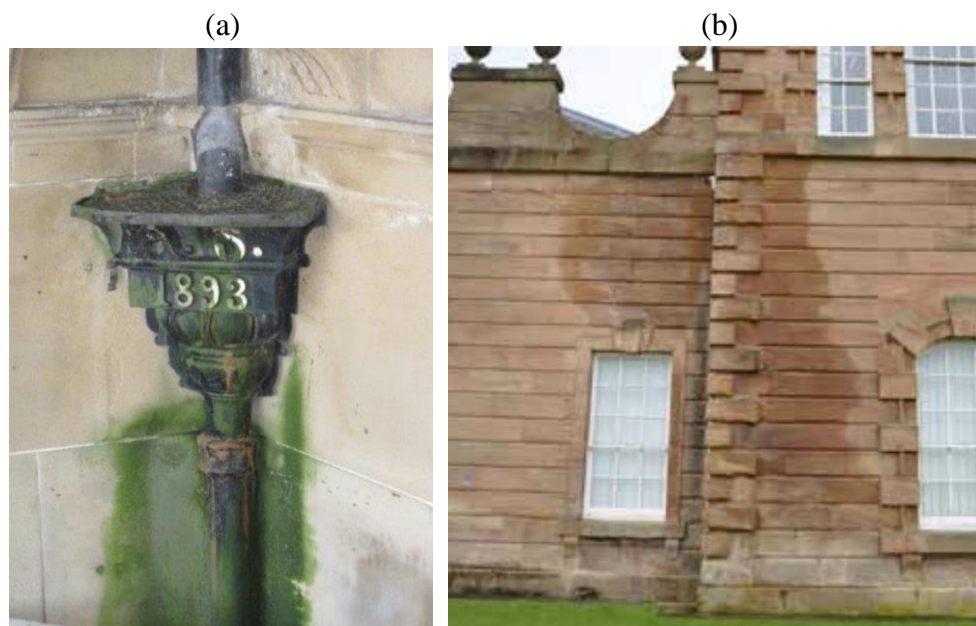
Rainwater damage to historic buildings: (a) hopper and downpipe in poor condition causing leaking, damp and algae growth; (b) blockage in parapet gutter causing overtopping, damp and staining of stonework (adapted from Renshaw, 2015; and Curtis & Kennedy, 2016)
